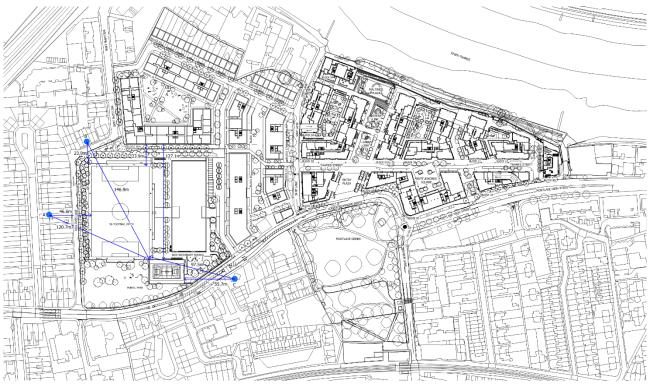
MUGA & 3G sports pitch - typical ground floor plan.
